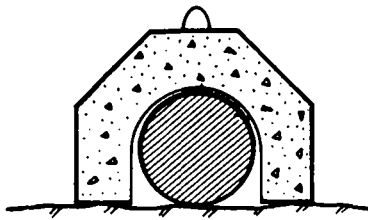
Concrete weight used for loading. Mounted after submersion.
